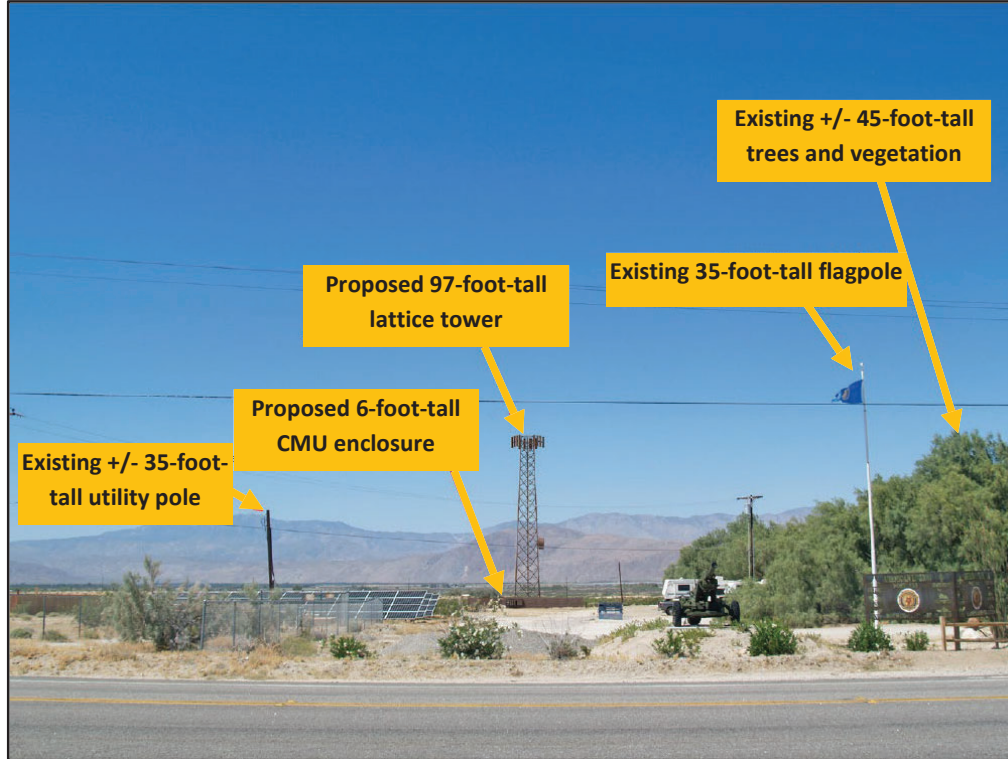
View of proposed 97' lattice tower, looking north from Borrego Springs Road.
